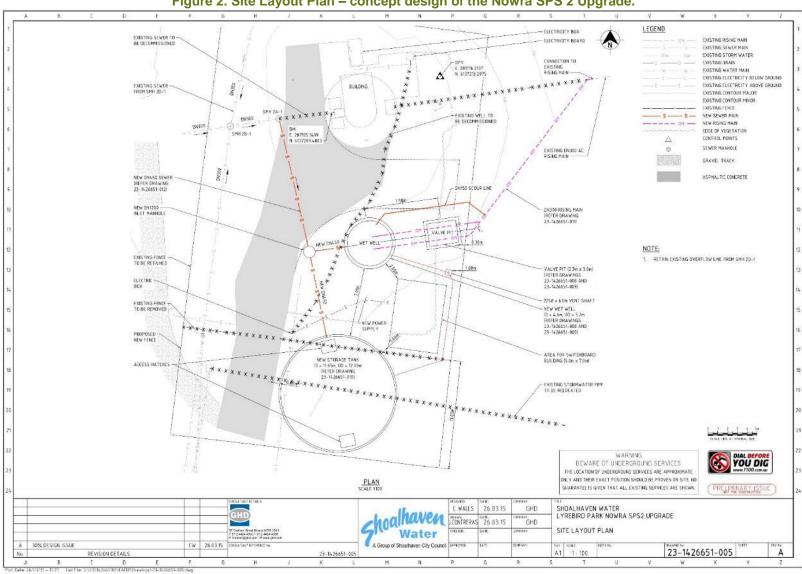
Site Layout Plan – concept design of the Nowra SPS 2 Upgrade.
